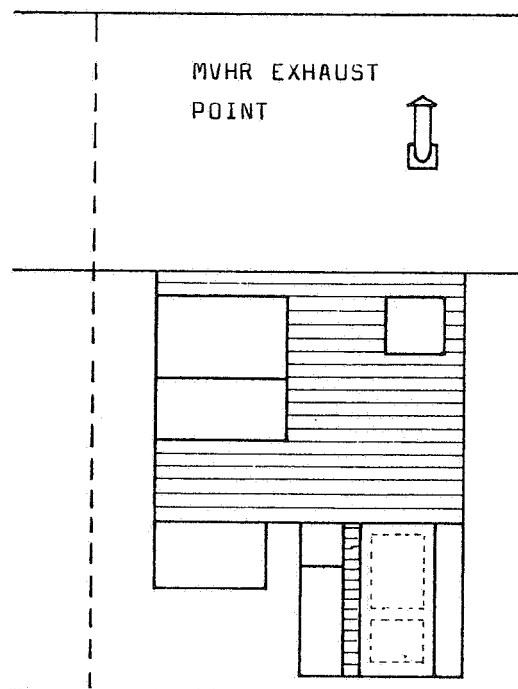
TEST HOUSE: NORTH ELEVATION
